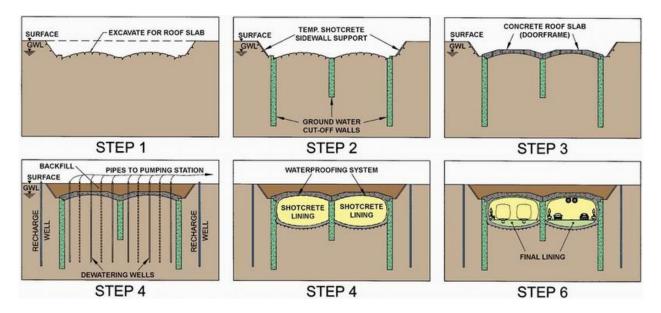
Proposed installation sequences sections for JFK Airport Access Tunnel - New York, NY 1998
